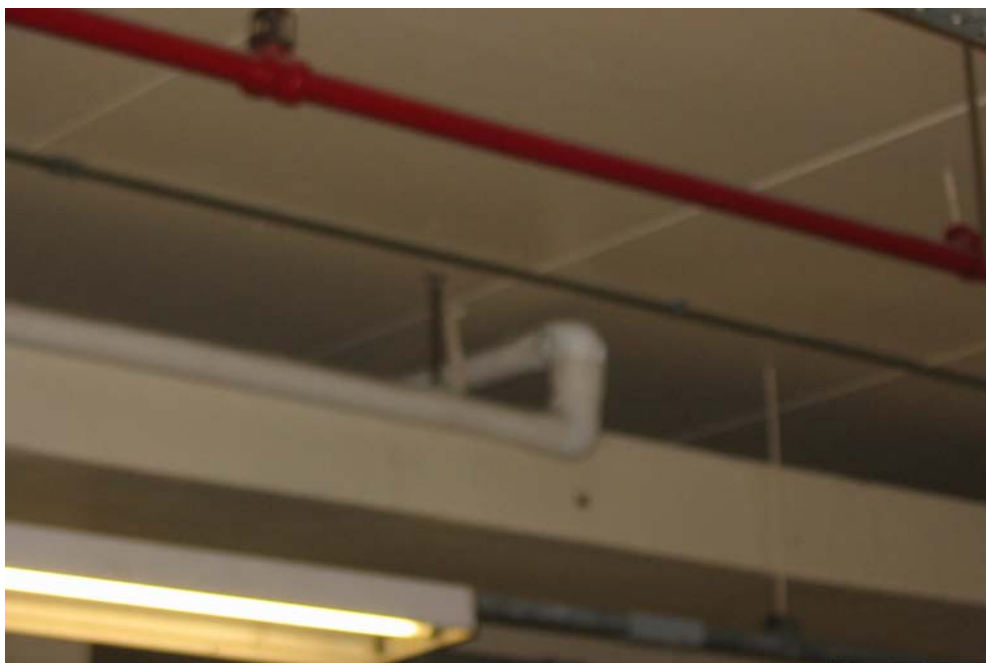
WW15 – Room 114 – Part of the pipe run that was found to contain more than 75% chrysotile asbestos. The pipe run was found to be in good condition.
